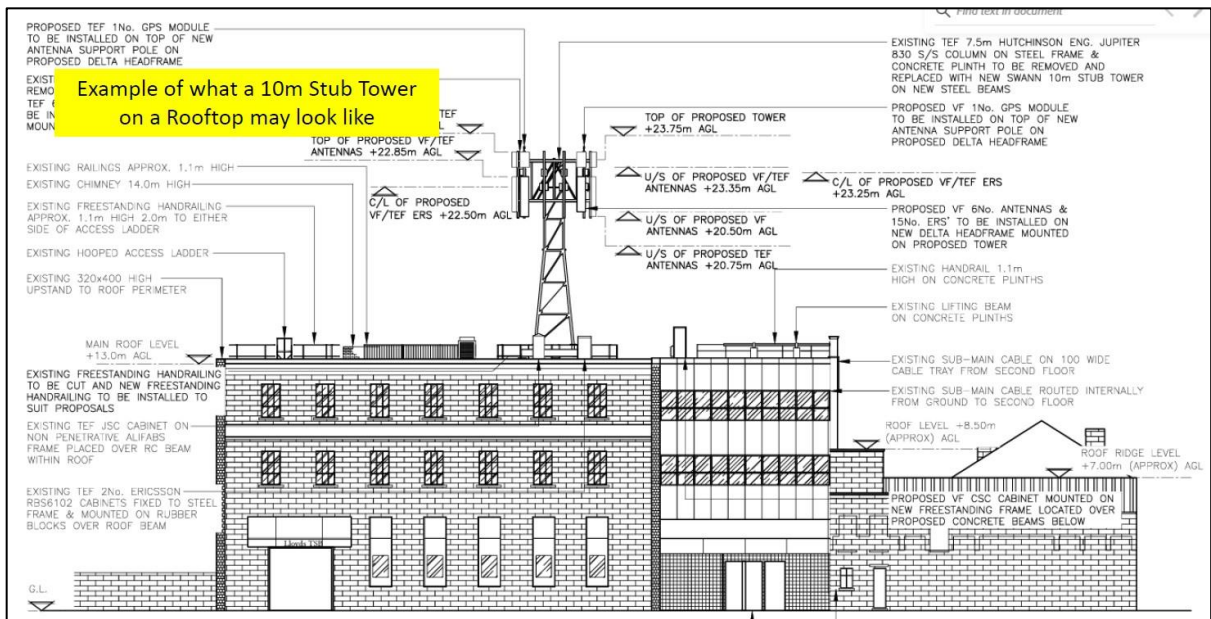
Example of a 10m High Stub Tower on a rooftop (*Not to scale and only for reference*).
